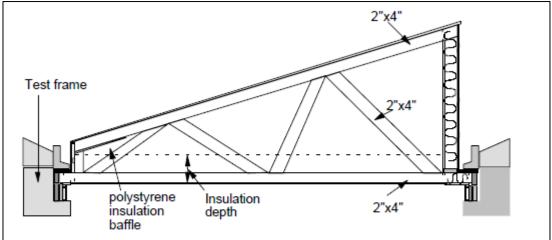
Sketch of section of the raised heel wood-truss roof construction in the test frame intended to represent half of a typical roof structure. The trusses were constructed of 2" by 4" lumber (38 mm by 89 mm) and with a 4 in 12 slope.
